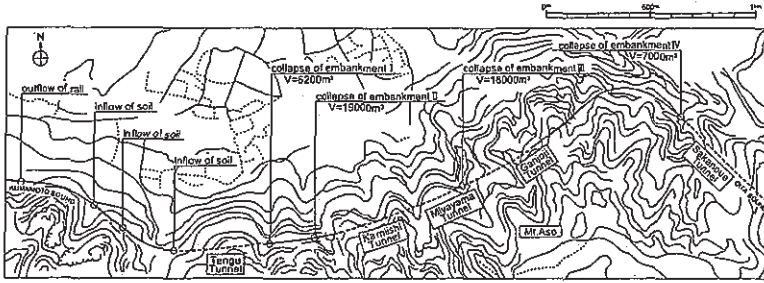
Plan of main damaged locations of Hohi-Line at Aso site
